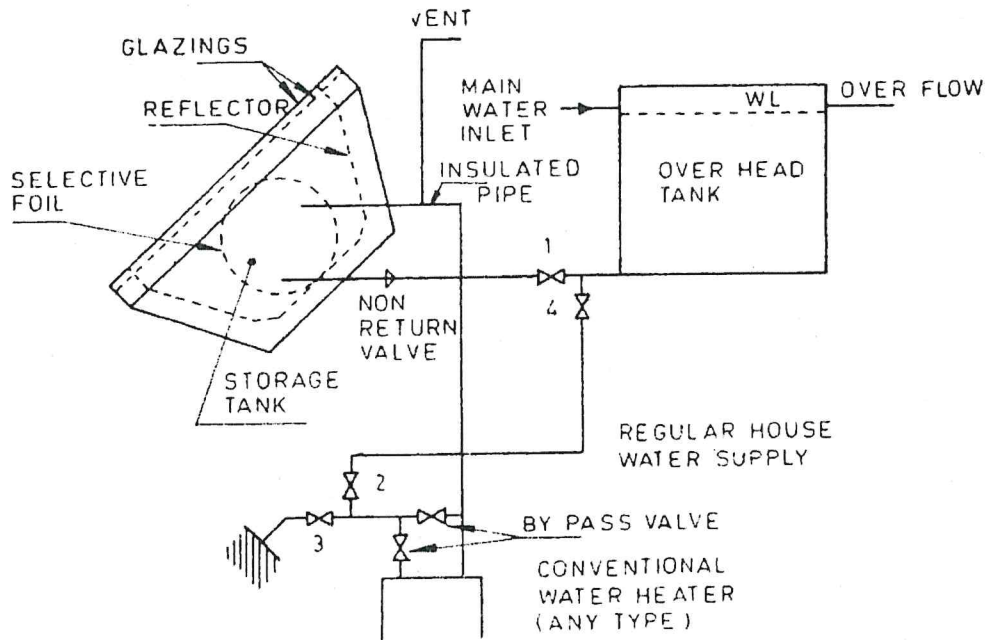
A SCHEMATKS OF BUILT-IN STORAGE SWH (SINGLE CYLINDER)
